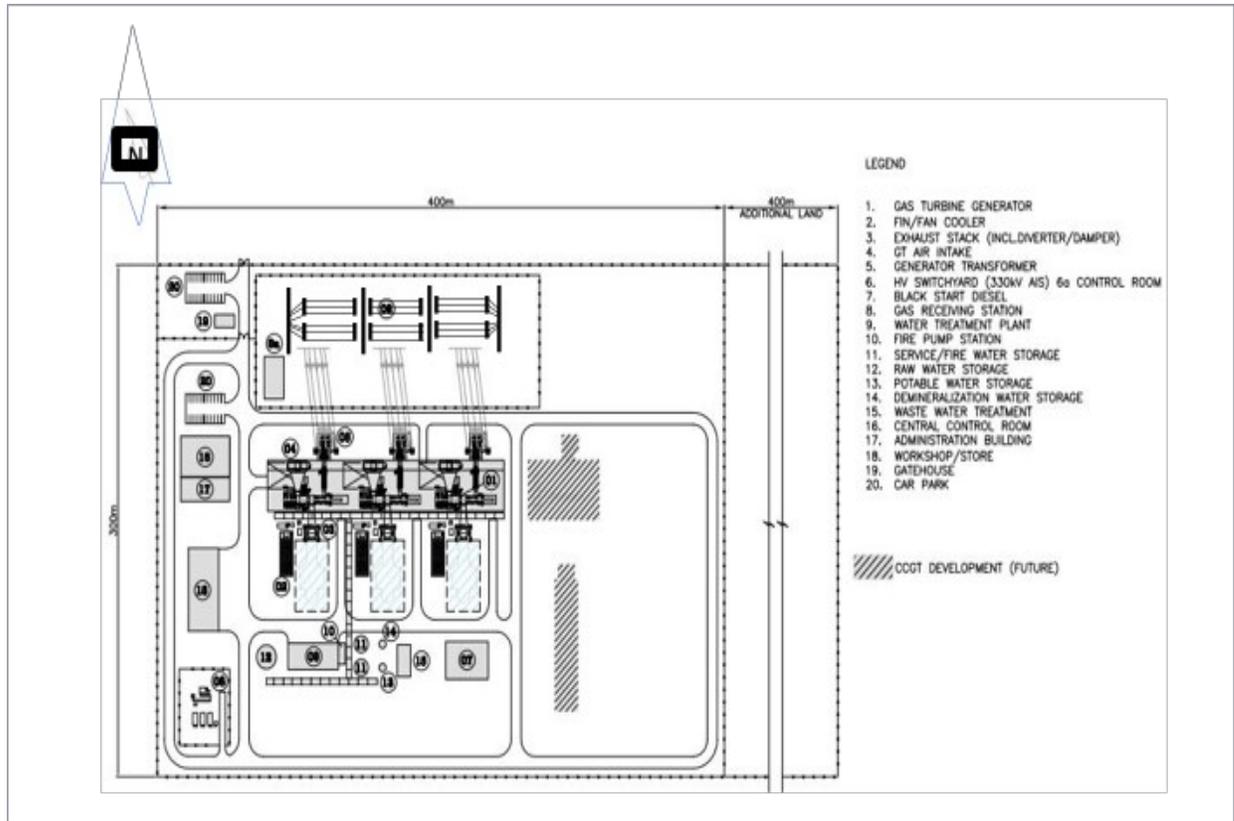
DeSadel CCGT Plant Layout Showing Locations of Plant Components
